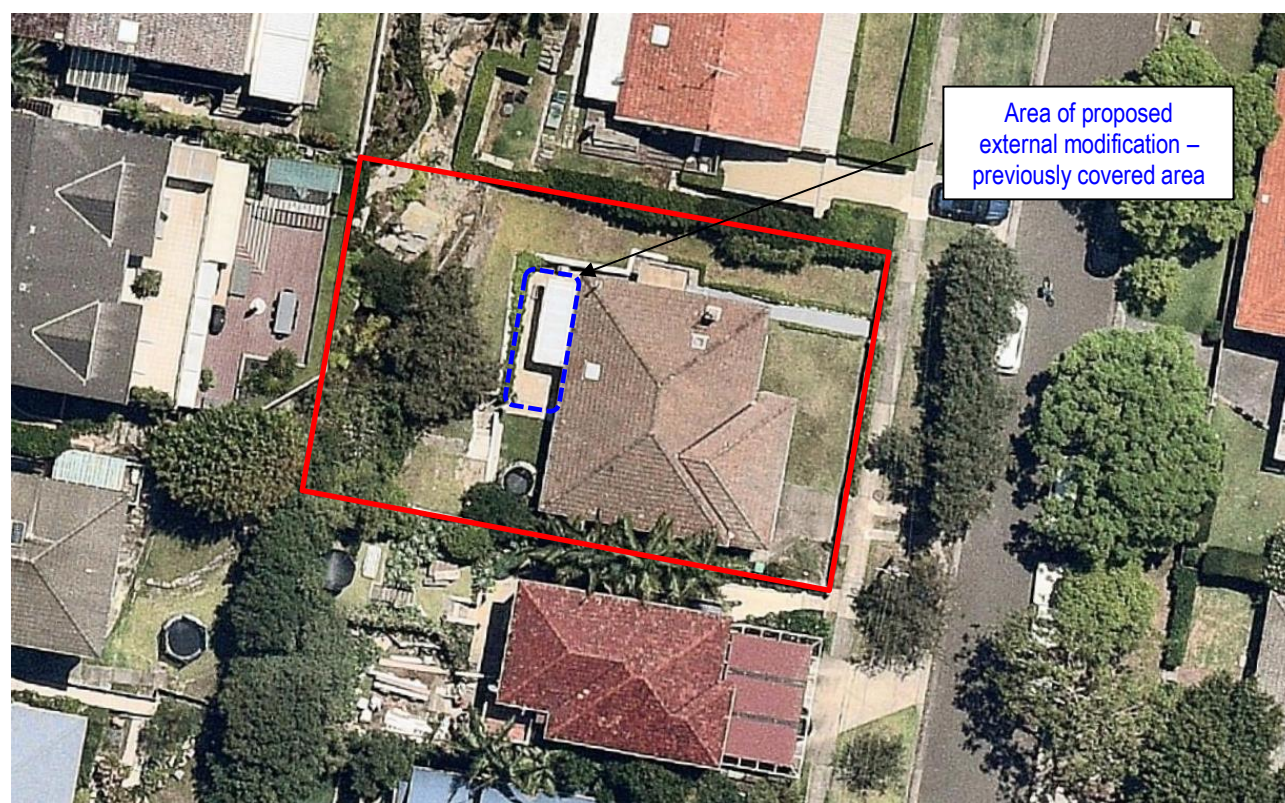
Aerial Photograph of Subject Site – Taken prior to the commencement of the DA works
